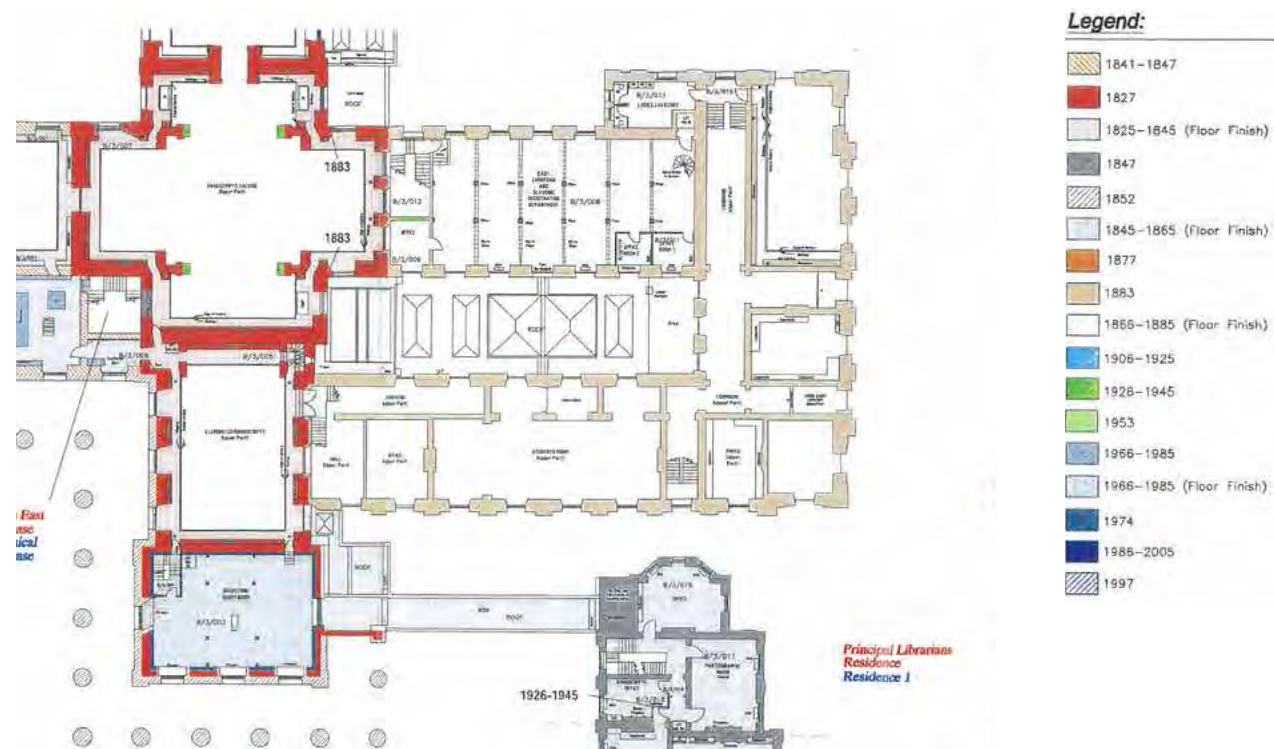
Level 03 Historical Development Plan (extract from Conservation Plan)
